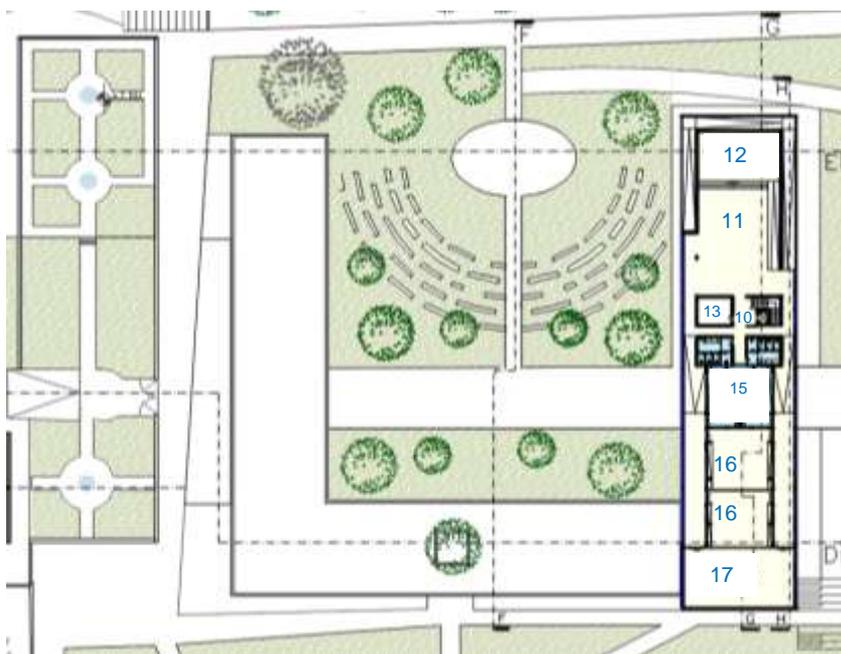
Floor plan 0 of the proposed building – Cultural Center (Source: author, 2017)
